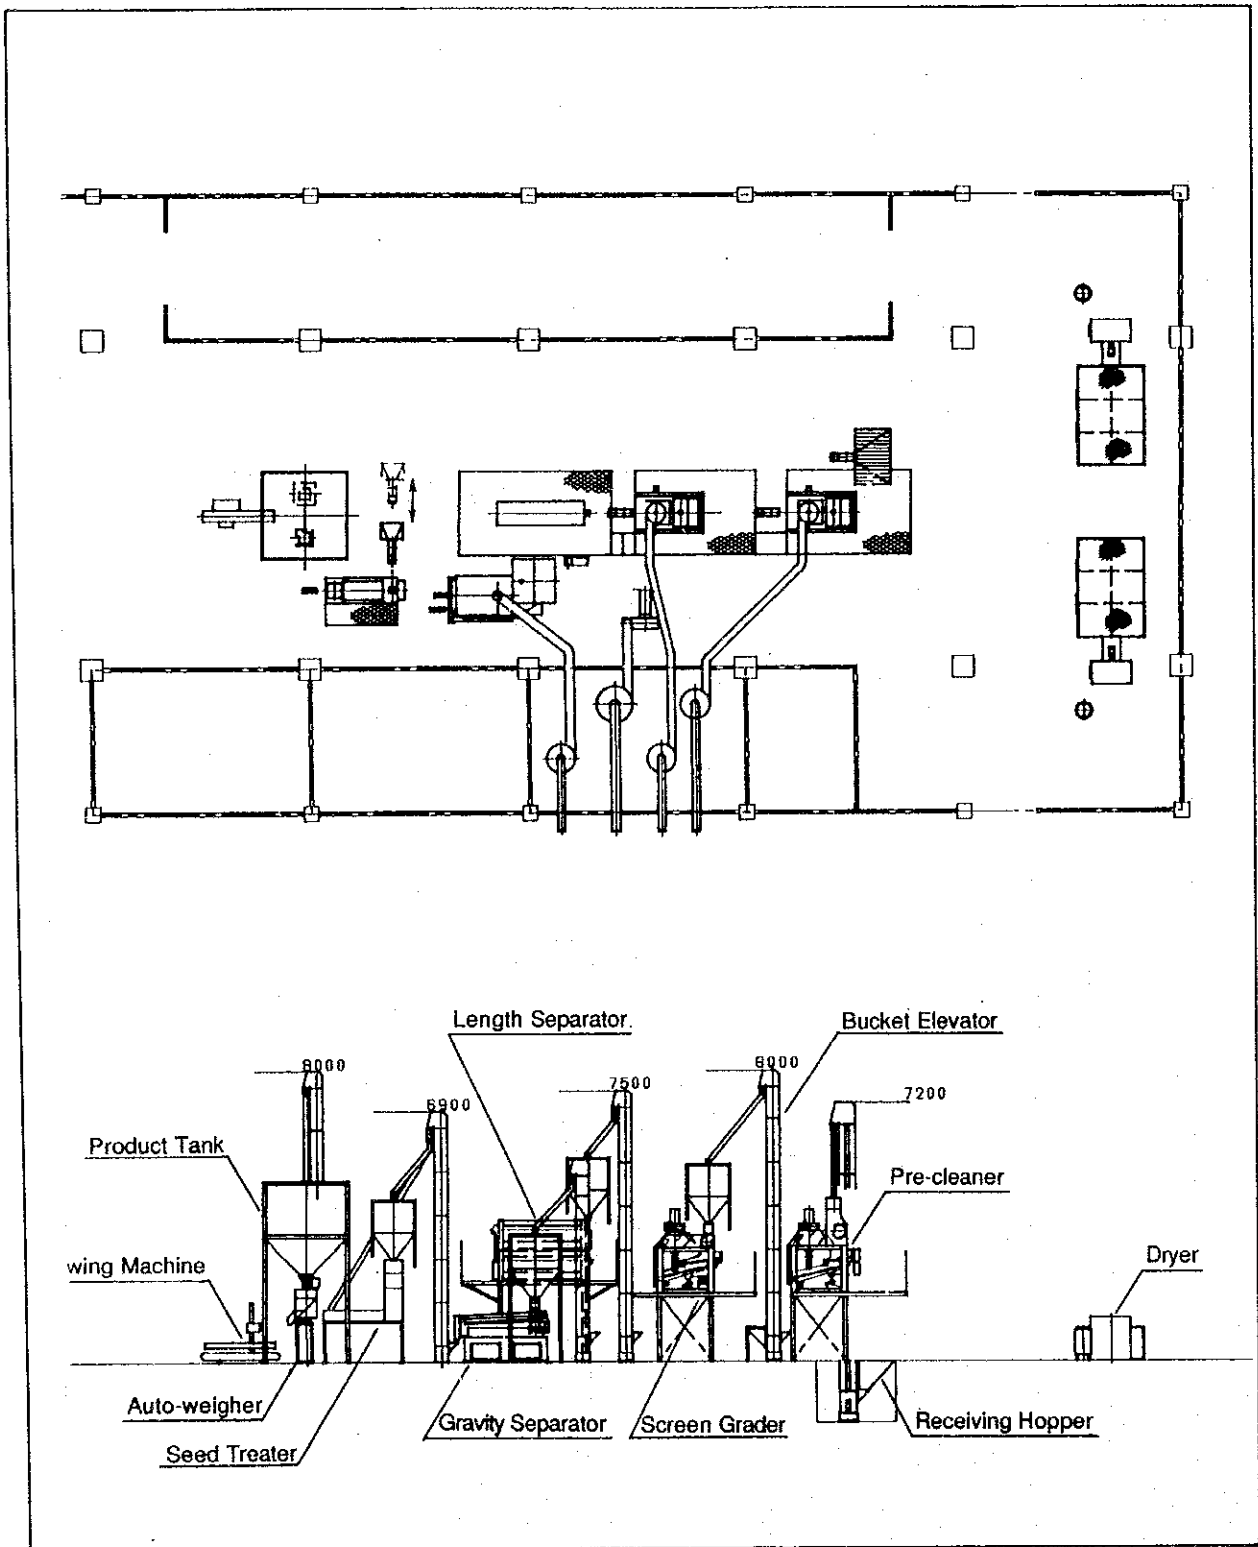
Layout of Cereal Seed Processing Equipment
